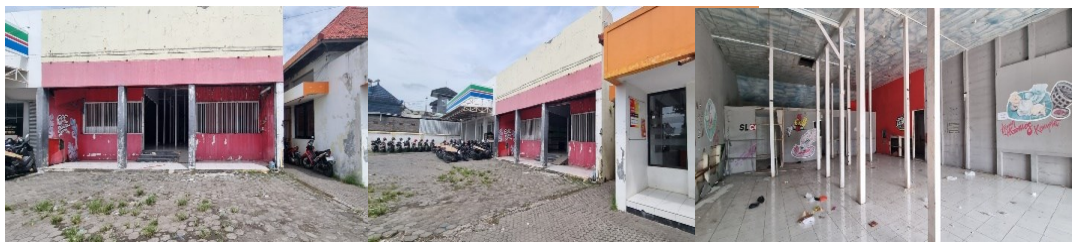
The rest of the stilt building, the stilt floor, was replaced with ceramics. Meanwhile, the interior, such as the pillars, walls, roof, and ceiling, is still intact: survey 2022
